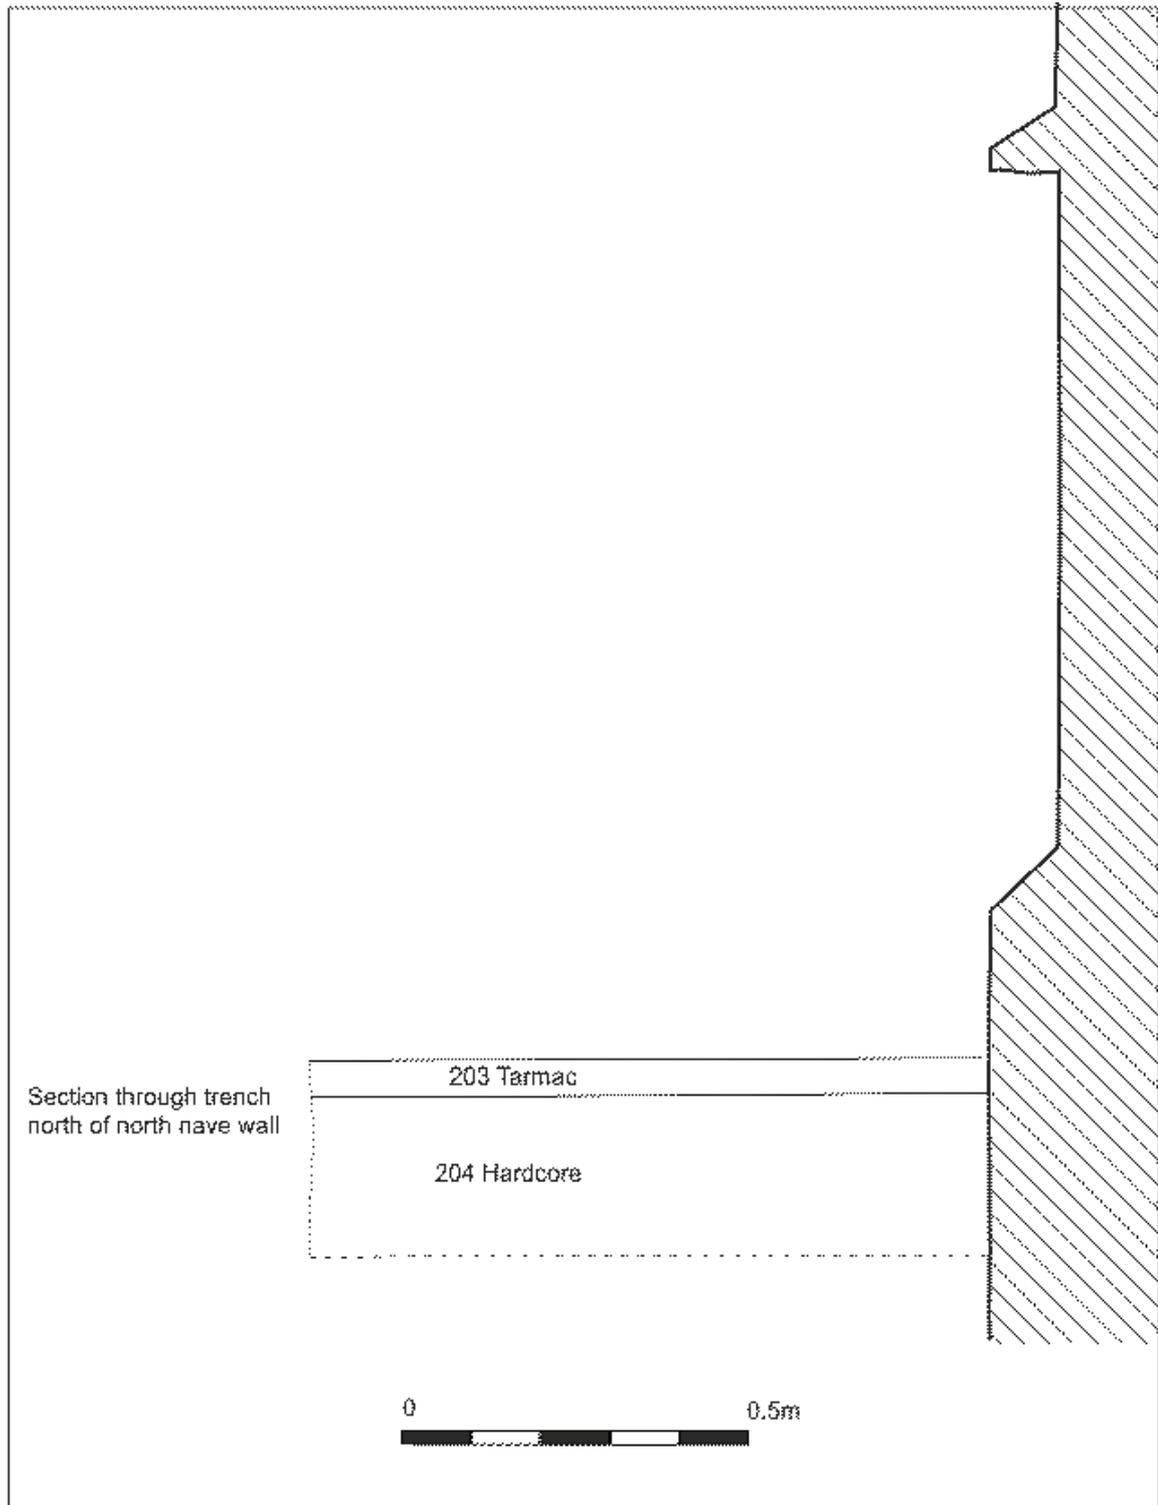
Profile of north aisle north wall and adjacent footpath, showing sequence of deposits in drainage trench
